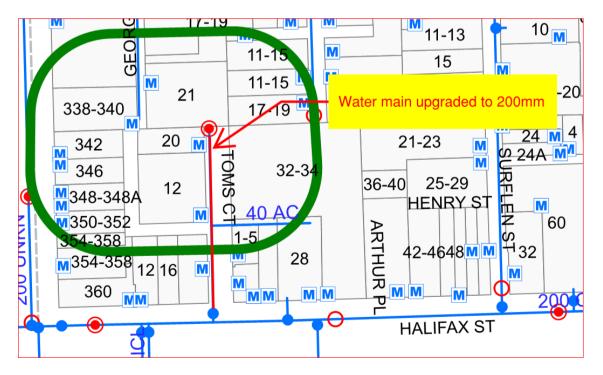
Proposed Upgrade to SAWC infrastructure and new DCW connection in Toms Court.
